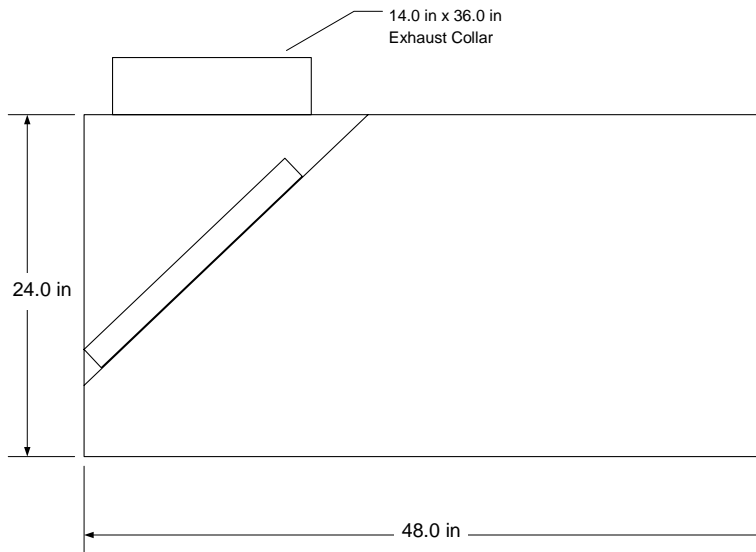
Cross Section Drawing of the Exhaust Only Canopy Hood
